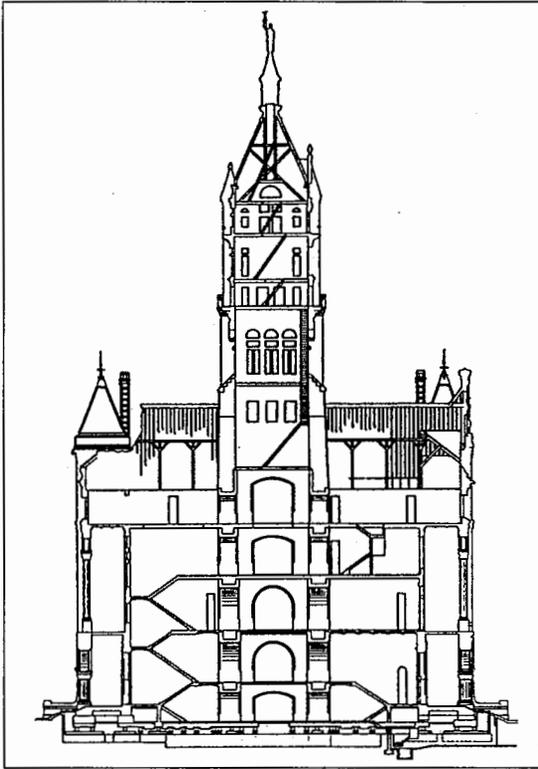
Section view of the City and County Building, Salt Lake City.
